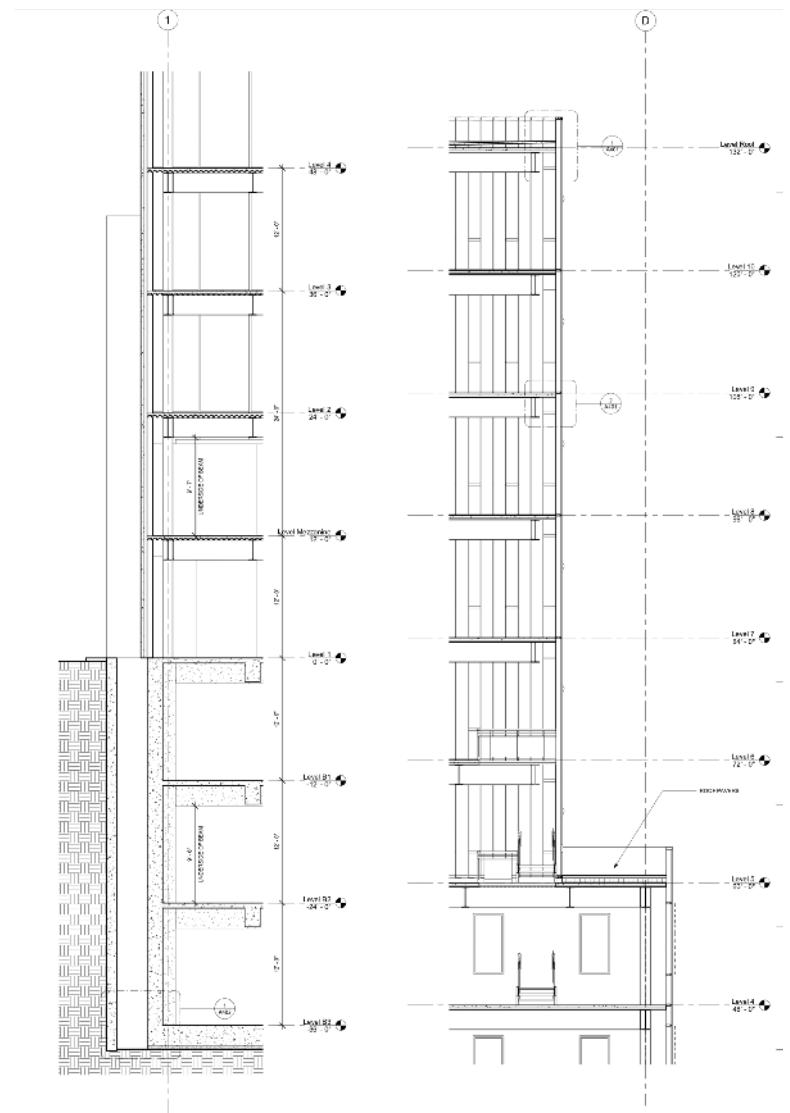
DETAIL SECTION - CAVITY WALL AT FLOOR
